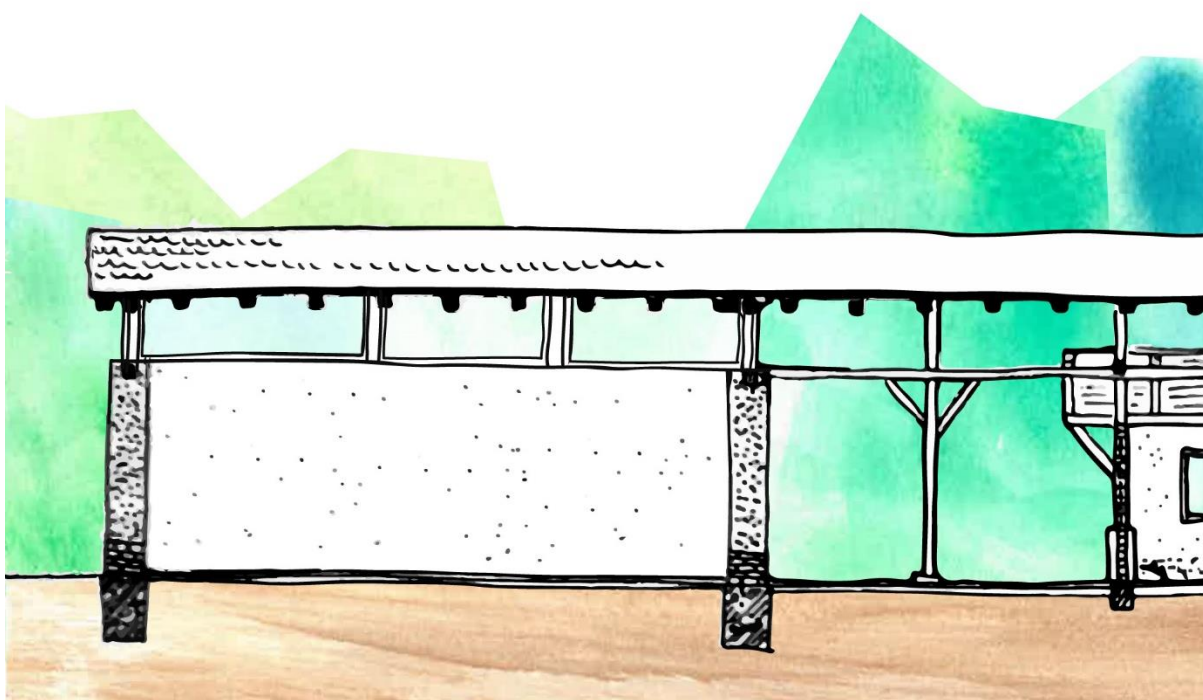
Section B of the visitor's facility, Part 1, scale 1:100
